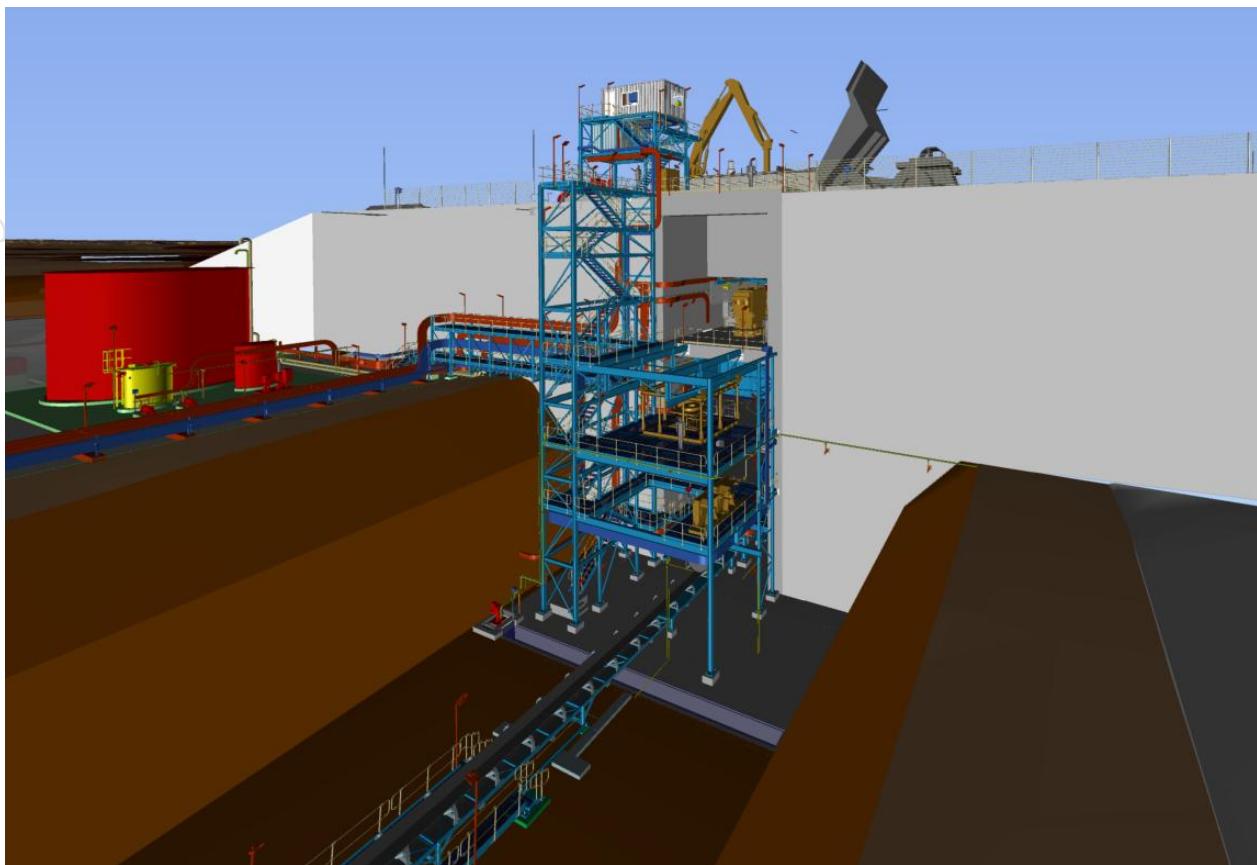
Dry plant detailed design drawings: Primary crusher installation.
